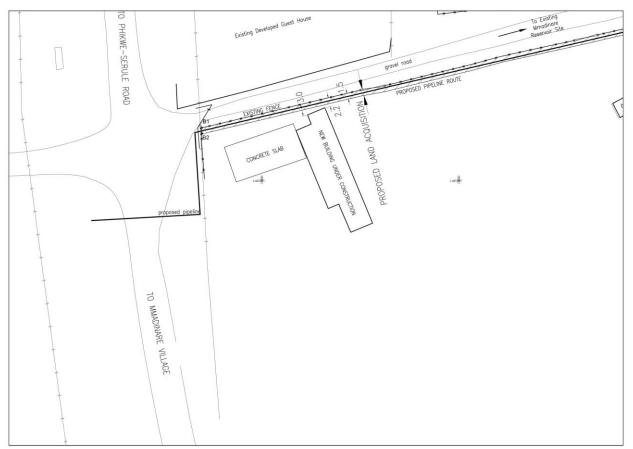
Land Area to be Acquired from PAP 1 for laying of pipeline to the Mmadinare Reservoir Following Site Visit in November 2019 when it was discovered PAP1 begun construction on his site leaving a maximum of 2.2m width within which 1.5m width is to be acquired.
